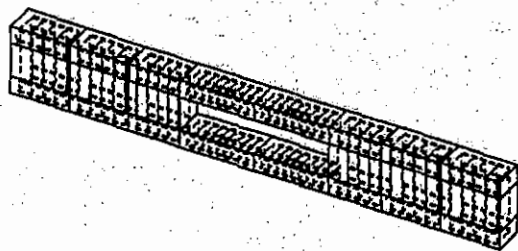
FE Modeling of steel bars as imbedded reinforcement for beam B4
